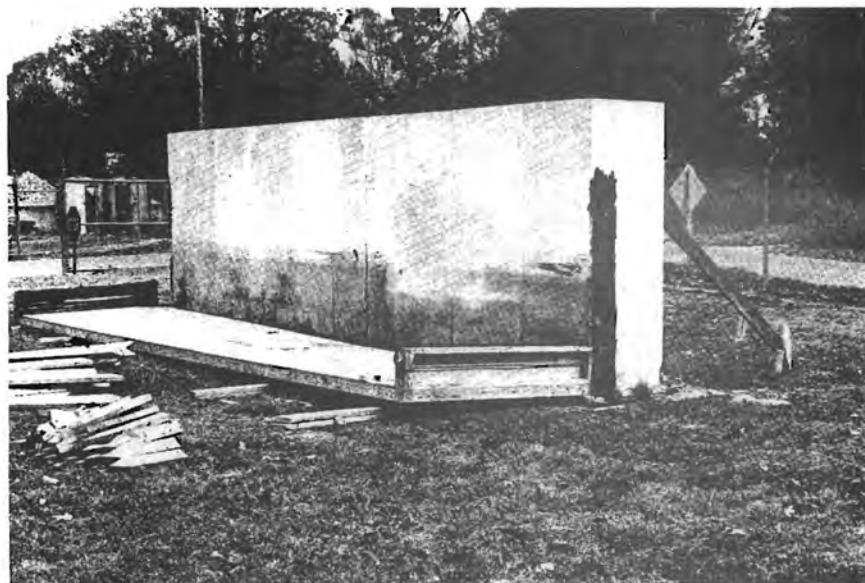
Wall 3. Brick-veneer wall deflection, vertical gage line
